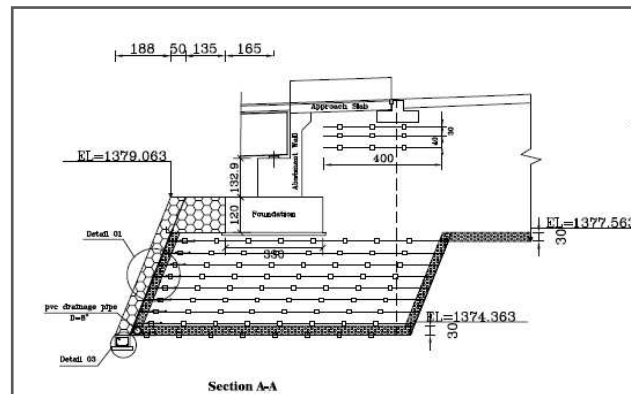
A cross section from Milad GRS bridge abutment (lower wall=3.5m, upper wall=4.0m, total height=7.5m)
